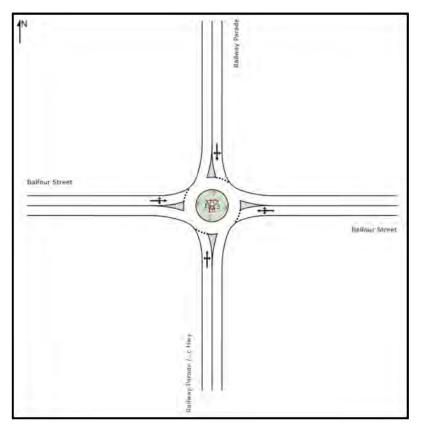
Balfour Street/Railway Parade SIDRA intersection layout
